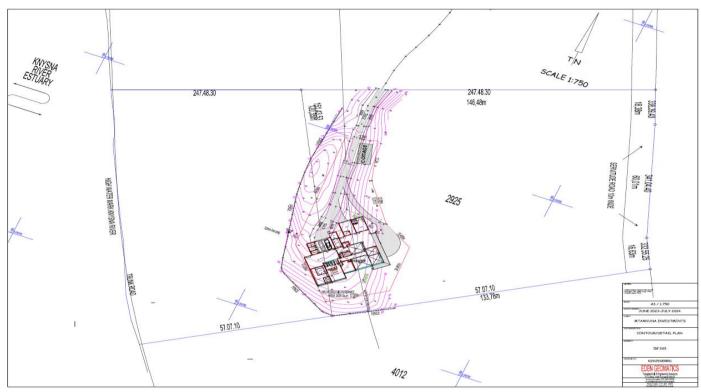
Site Development Plan (Eden Geomatics, 2025)
